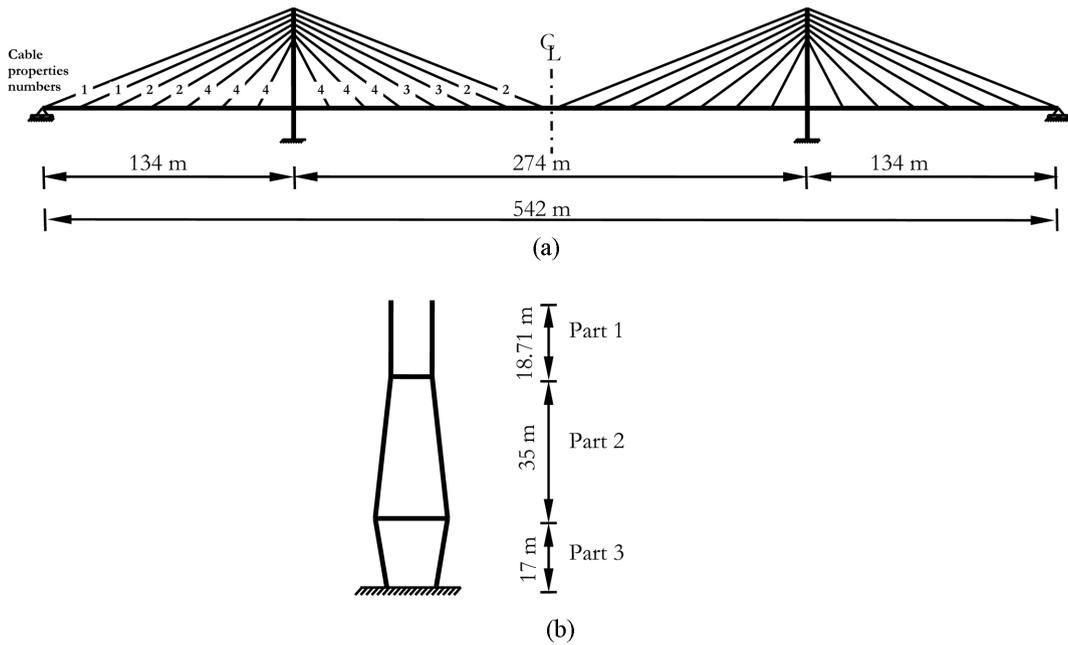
Details of (a) the cable-stayed bridge model, and of (b) the towers
